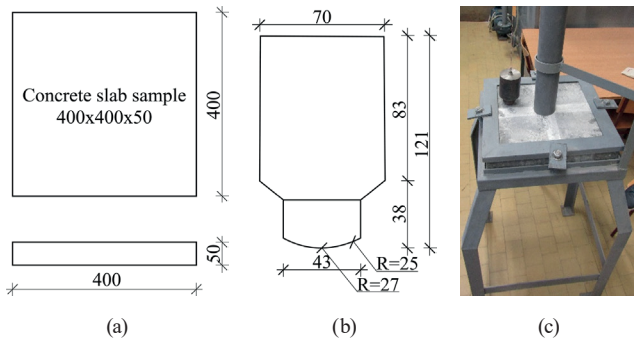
Experimental test (measures in mm); (a) slab specimen; (b) steel weight; (c) test setup with specimen
